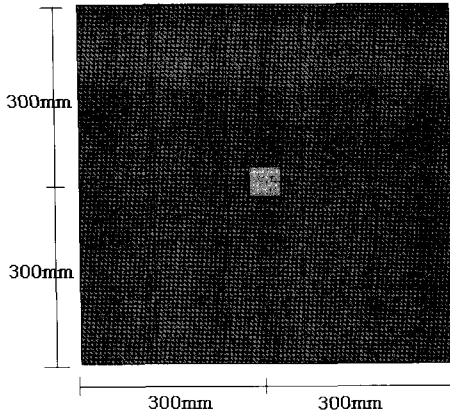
Plan view of artificial delamination placed at the center of fiber reinforced specimen
